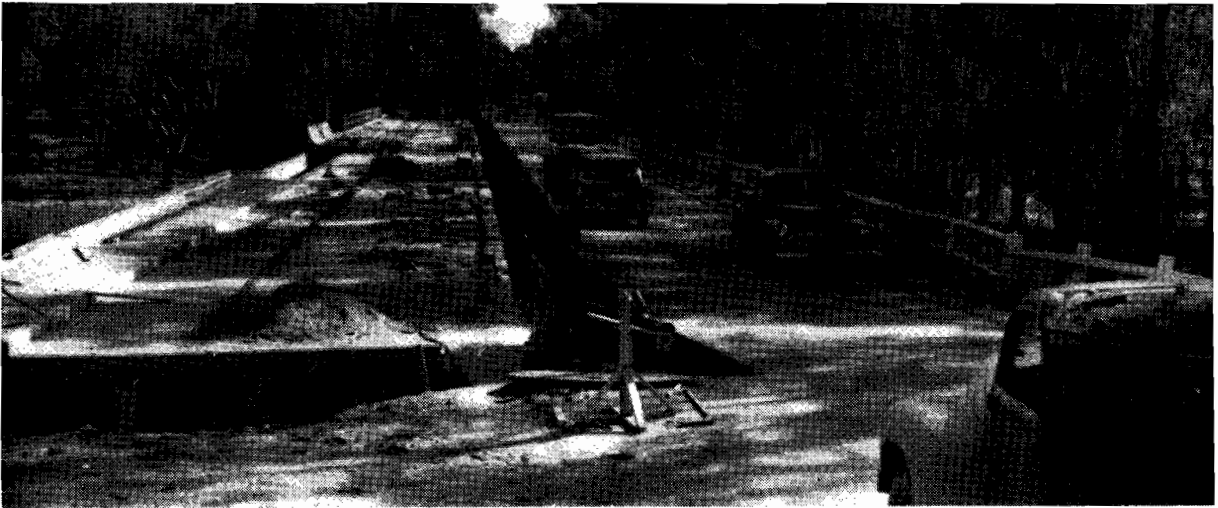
One of the new concrete bridges under construction on Midland Highway west of Shepparton, replacing old narrow wooden bridges.
